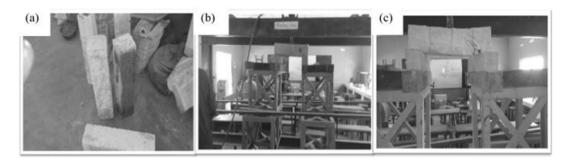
(a) Reinforced concrete beam after curing, (b) experimental setting of the beam for flexural test, (c) failure mode reinforced concrete beam
